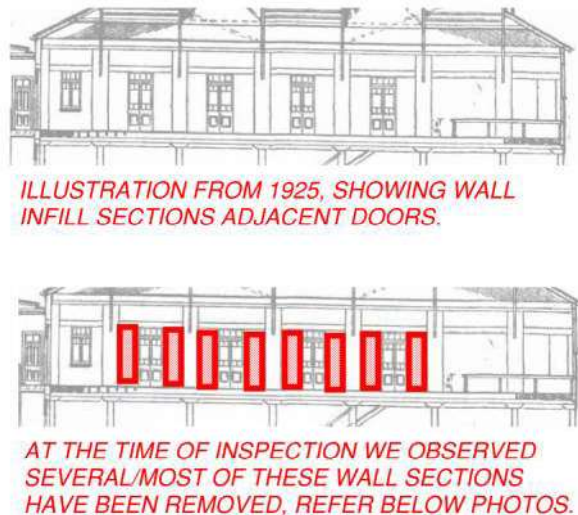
Upper -Level Clay Masonry with Sections of Clay Masonry Walls Removed Prior to Fire Event.
